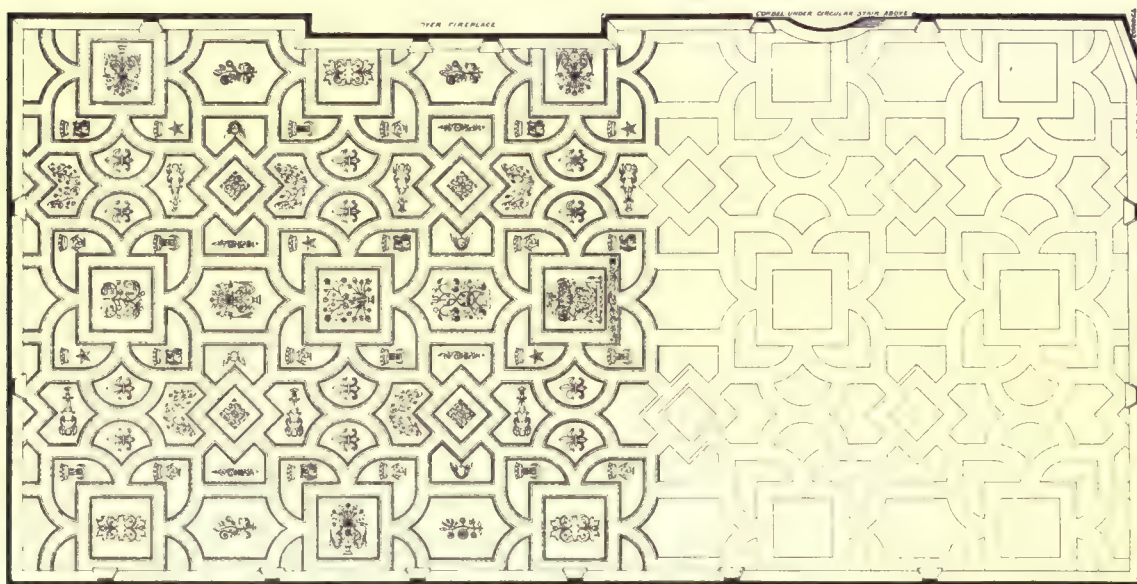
The Drawing-room Ceiling, Wintoun House, Haddingtonshire.
